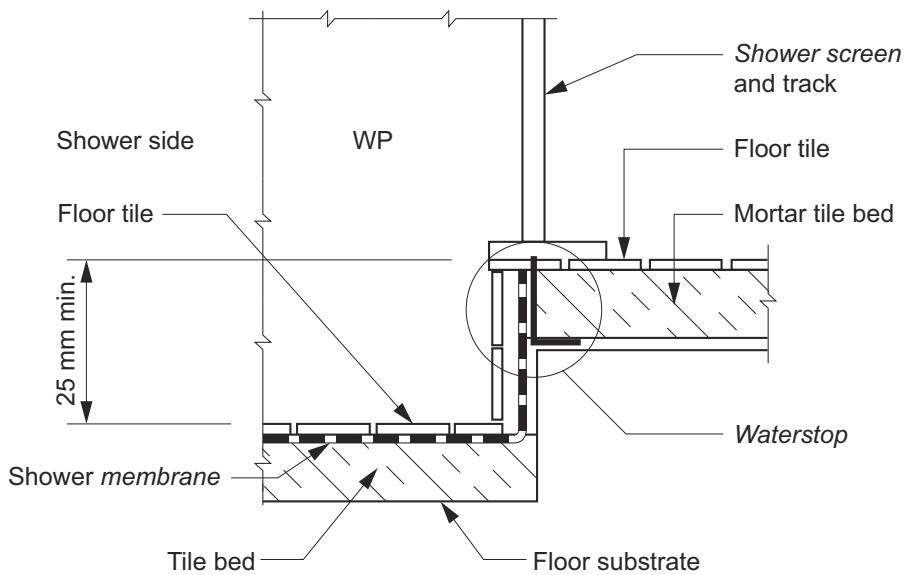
Typical enclosed stepped down shower construction (membrane above tile bed)
